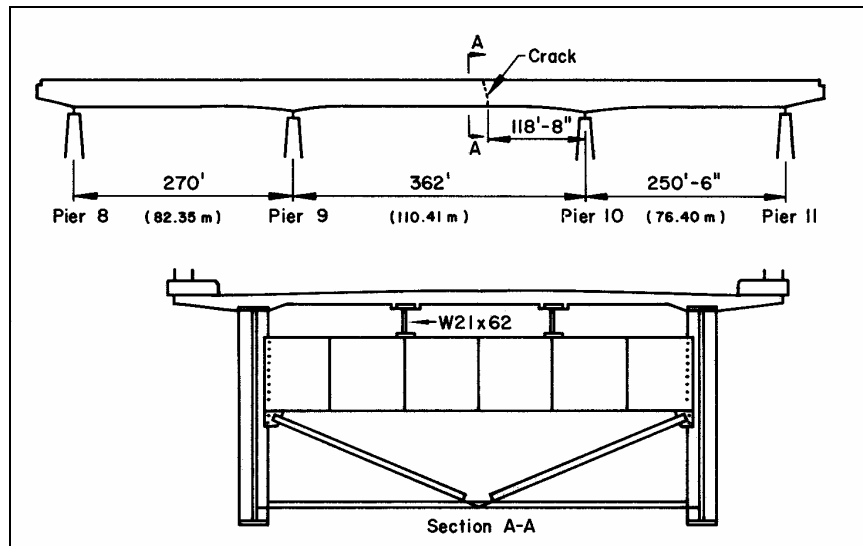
Elevation and Cross Section of the Lafayette Street Bridge (Fisher, 1984).
